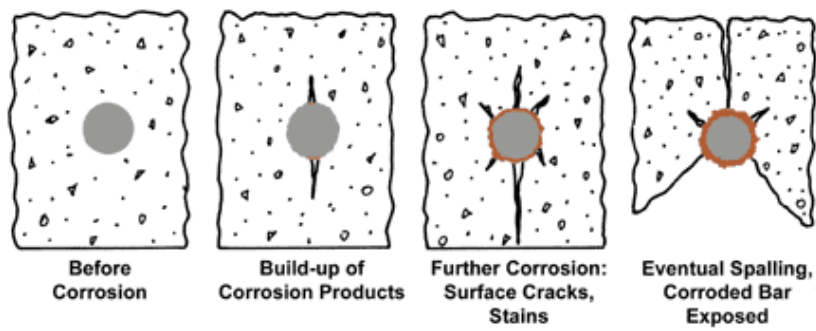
Cracking and spalling in reinforced concrete (www.galvanizedrebar.com/steel)
